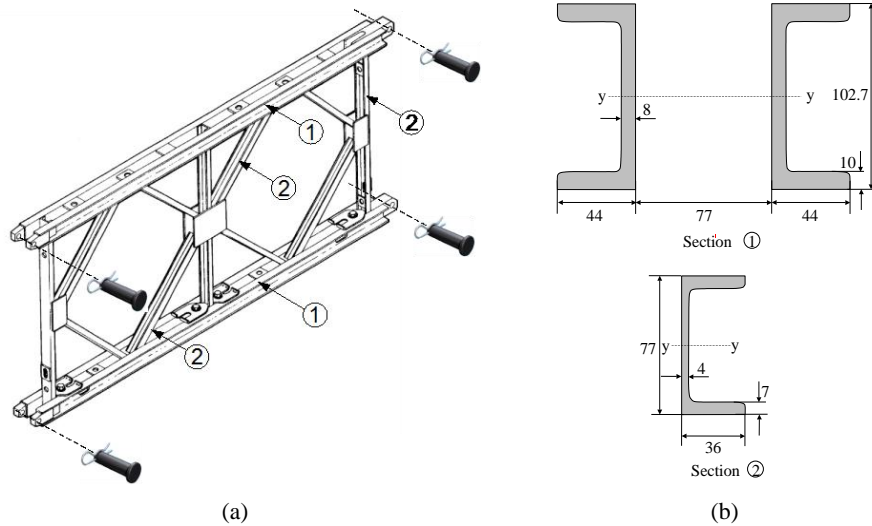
Typical panel of the bridge with chord bolts (a) and the corresponding sections (b)
